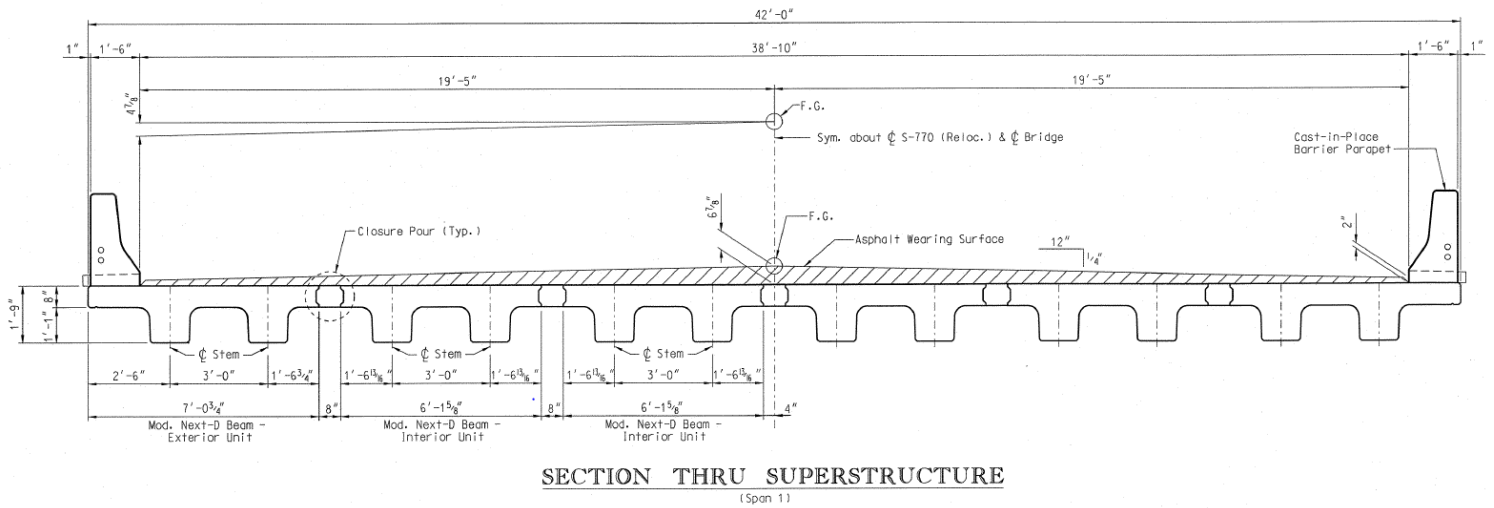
NEXT D Cross-Section from Hanging Rock Bridge
